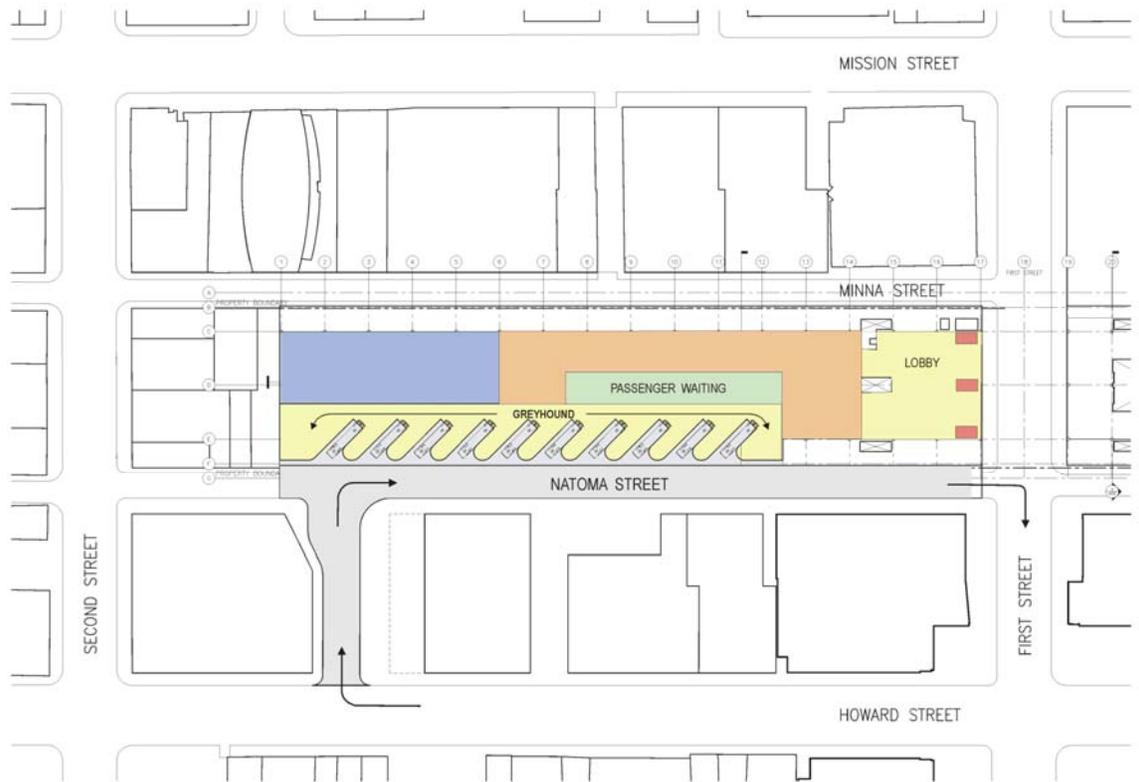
, Greyhound at the West End of the Transit Center Building- Interim Location
